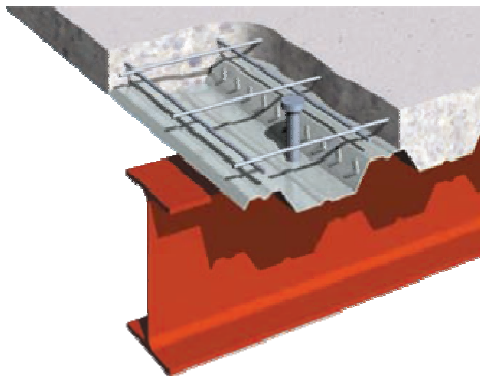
Conventional composite slab-on-girder construction using profiled steel decking (TATA steel, 2008)
